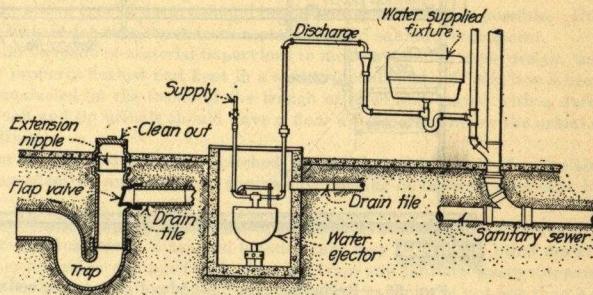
Method of connecting subsoil or tile drains with sanitary sewer.
